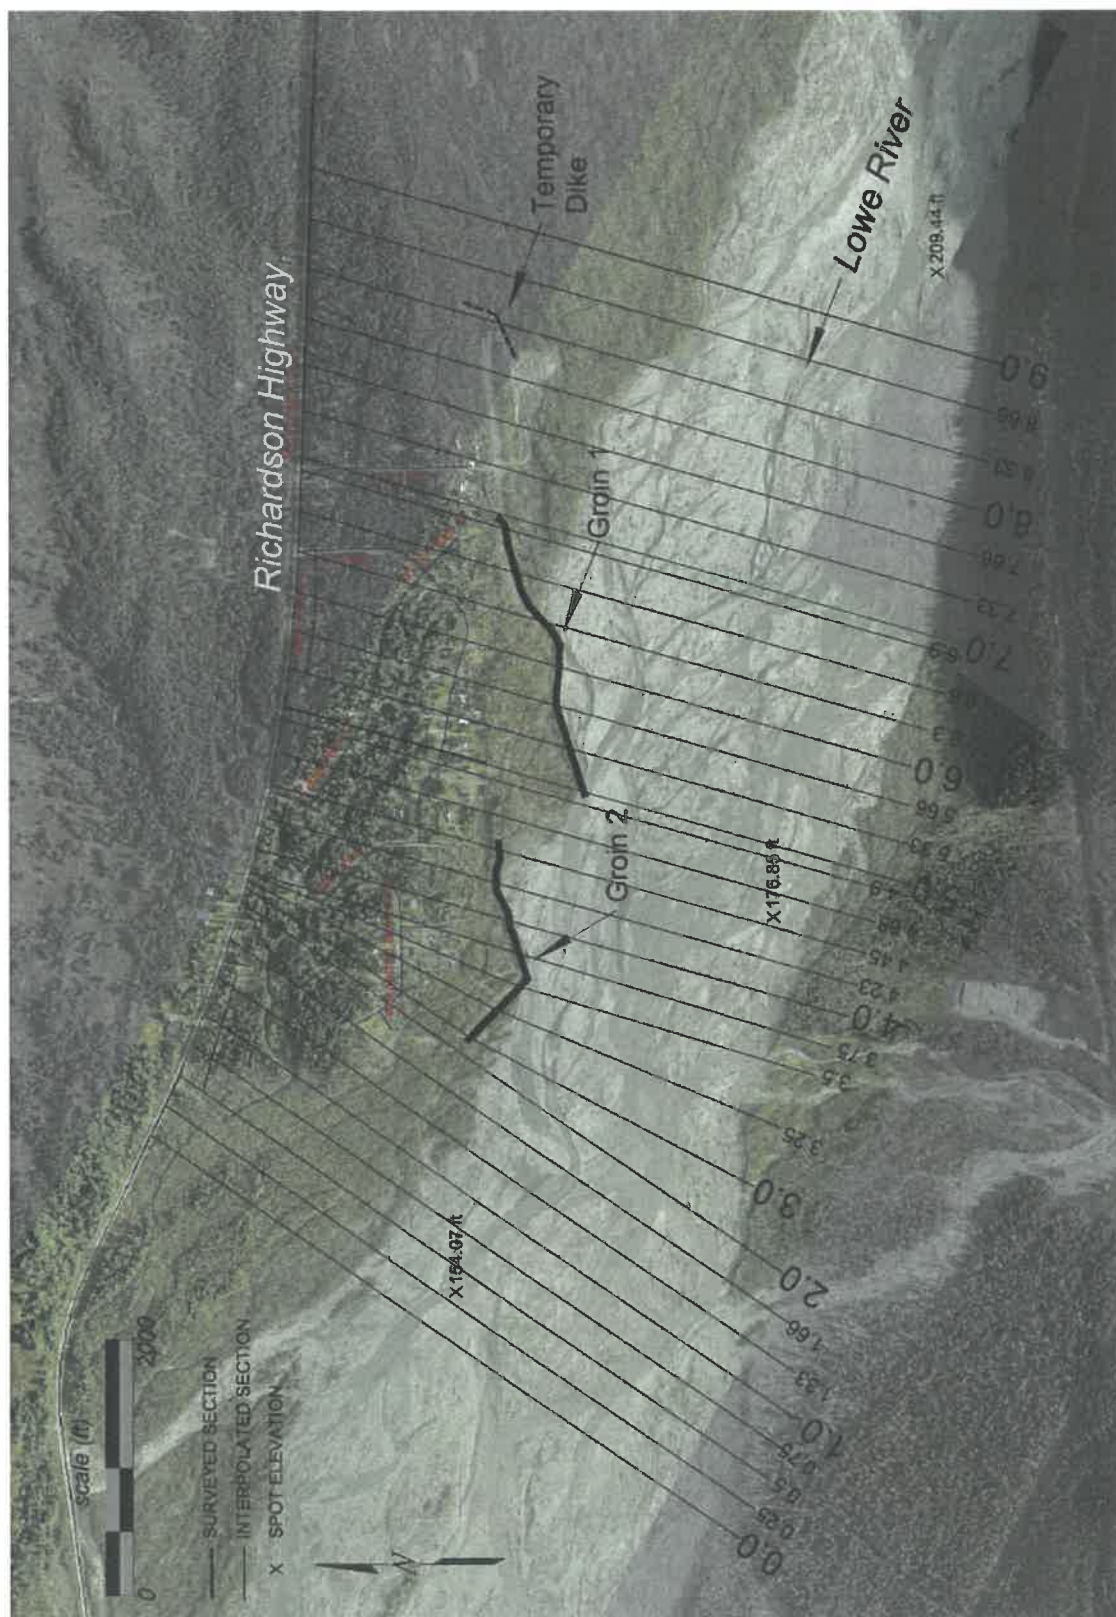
Aerial photograph of project site, with HEC-RAS cross-sections and existing groin locations.
